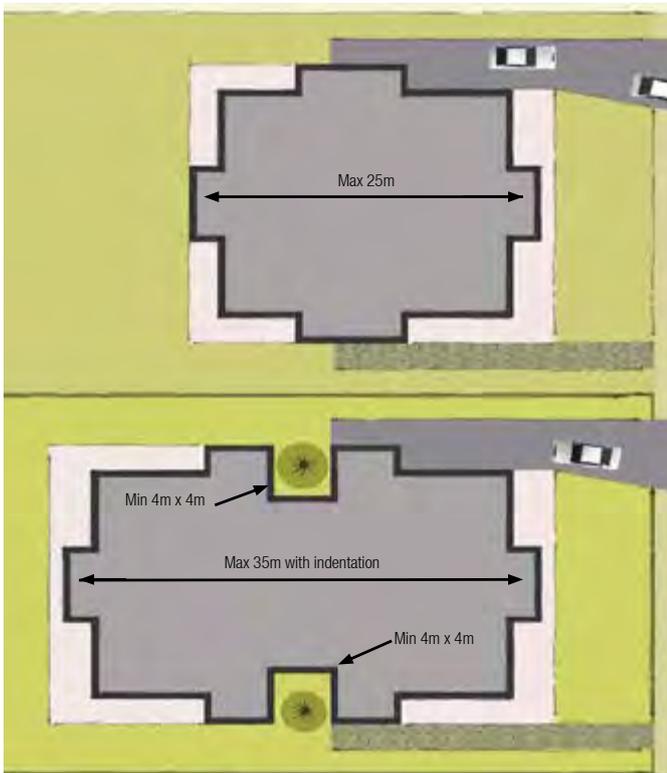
(f): Building floorplates should be limited in width and depth.(E)
